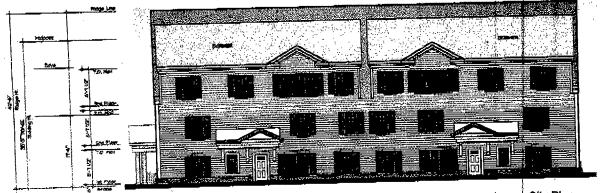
Hypothetical West Elevation with the proposed eaves removed. (Composite based upon City Place Site Plan submittal sheet A3.9b. The eave has been removed and replaced with siding.)
